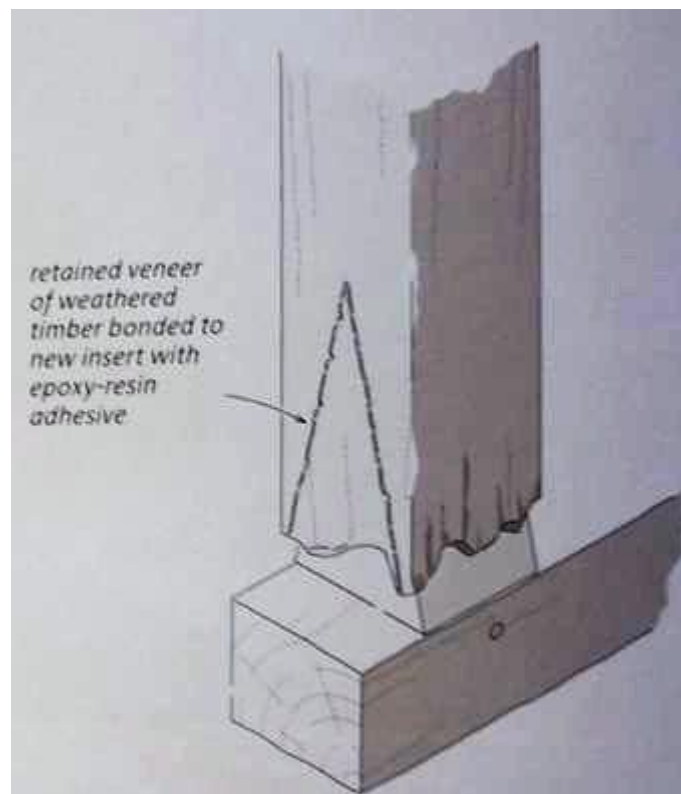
Joint intervention – New and old timber connected with epoxy resin [1].
